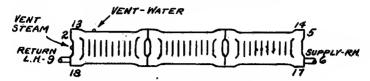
Assembled in single tier. Water or one and two pipe steam.
